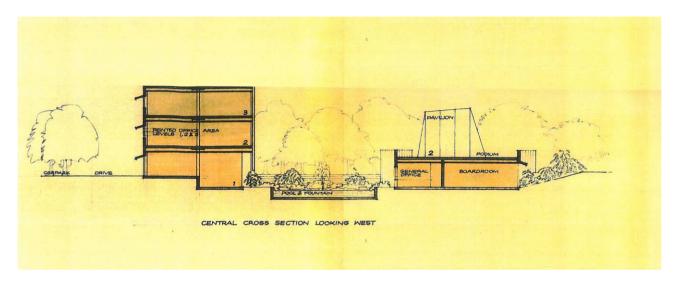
Boyd's original drawings of Churchill House – Central cross-section looking west (courtesy of Ann Cleary)
